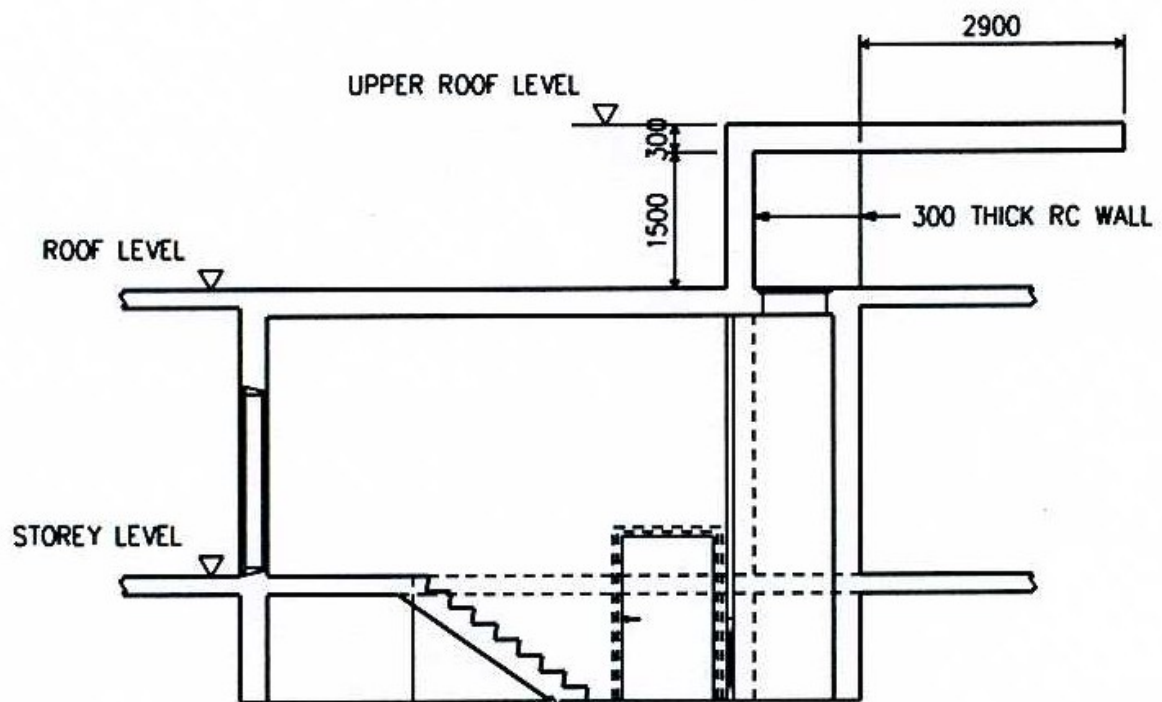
(a-5) SECTION Z - Z OF STAIRCASE STOREY SHELTER
